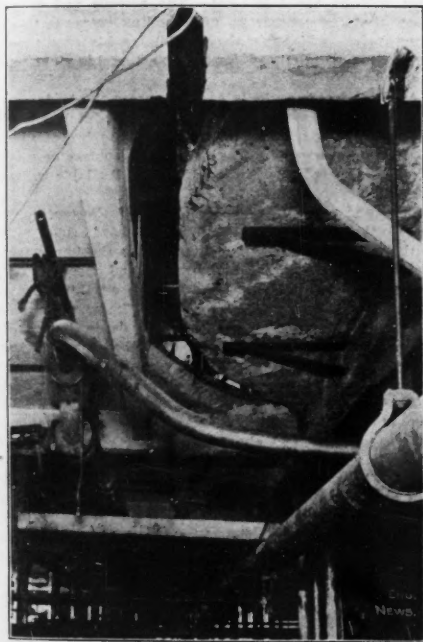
Interior View of the New York Sugar Refining Co.'s New Refinery, Showing a Cut in the Concrete Floor.
